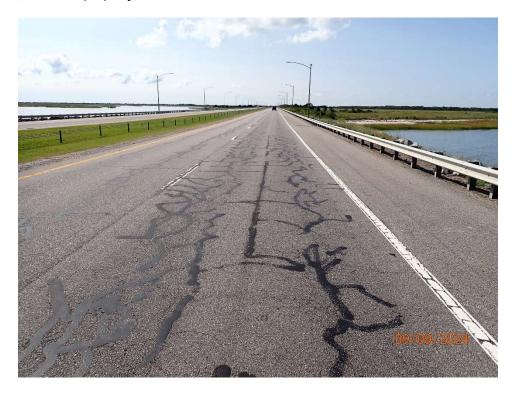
FIB Causeway looking south; Asphalt with up to 1/8" alligator cracking with majority sealed.
